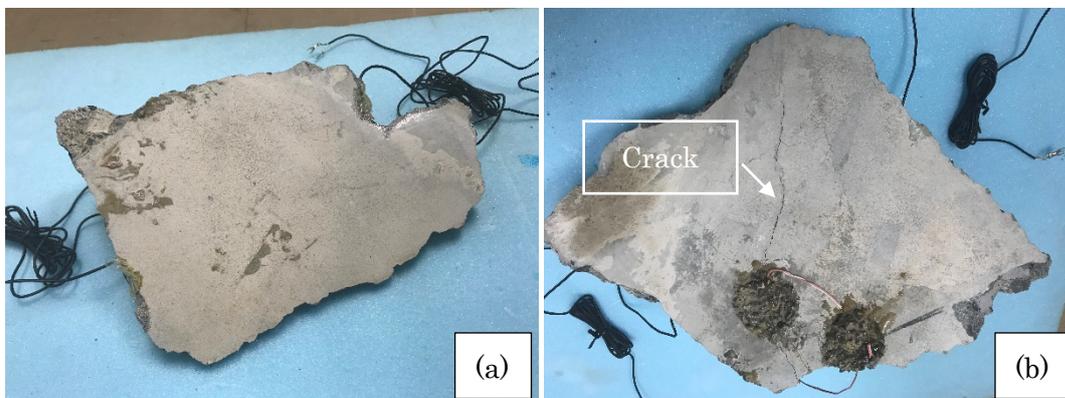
Concrete test pieces crashed by the steam pressure cracking agent, (a) piece having approximately 300 mm length without cracks, (b) piece having approximately 400 mm length with cracks.
